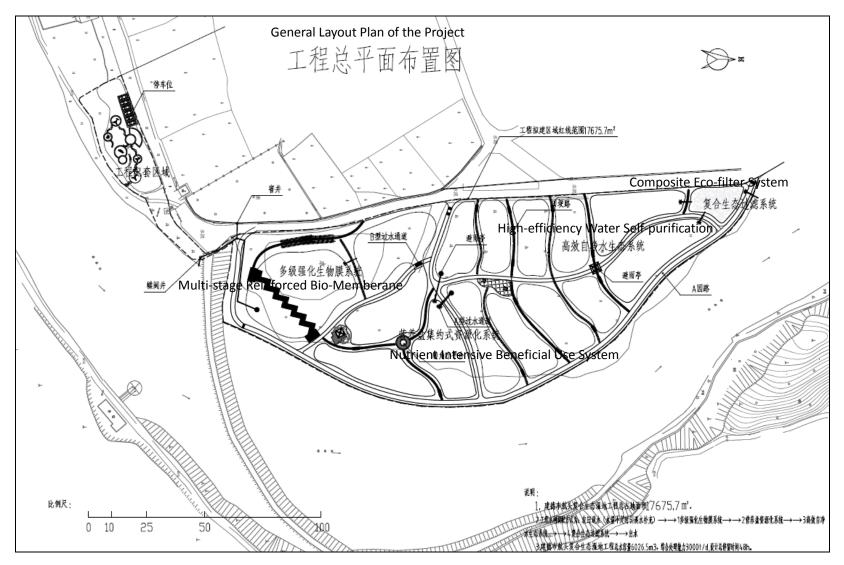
General layout plan of Hangtou Composite Wetland in Jiande City
